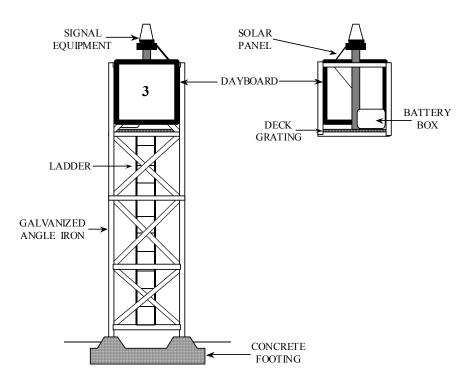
Freestanding Angle Iron Skeleton with Concrete Footings on Land
